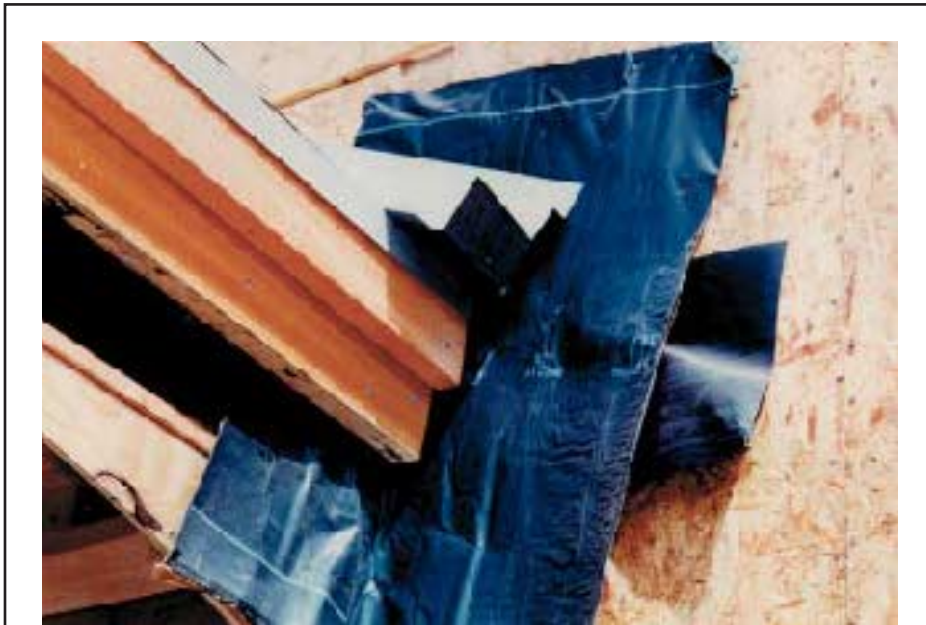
Flashing where roof trim meets a wall should be done before the framing is complete. The author protects the wall with a full-width sheet of self-adhering membrane, which overlaps lower courses of flashing paper at the bottom, but is itself overlapped by paper at the top and sides. It's also essential to install a metal kick-out flashing on the roof to direct runoff away from the wall.
